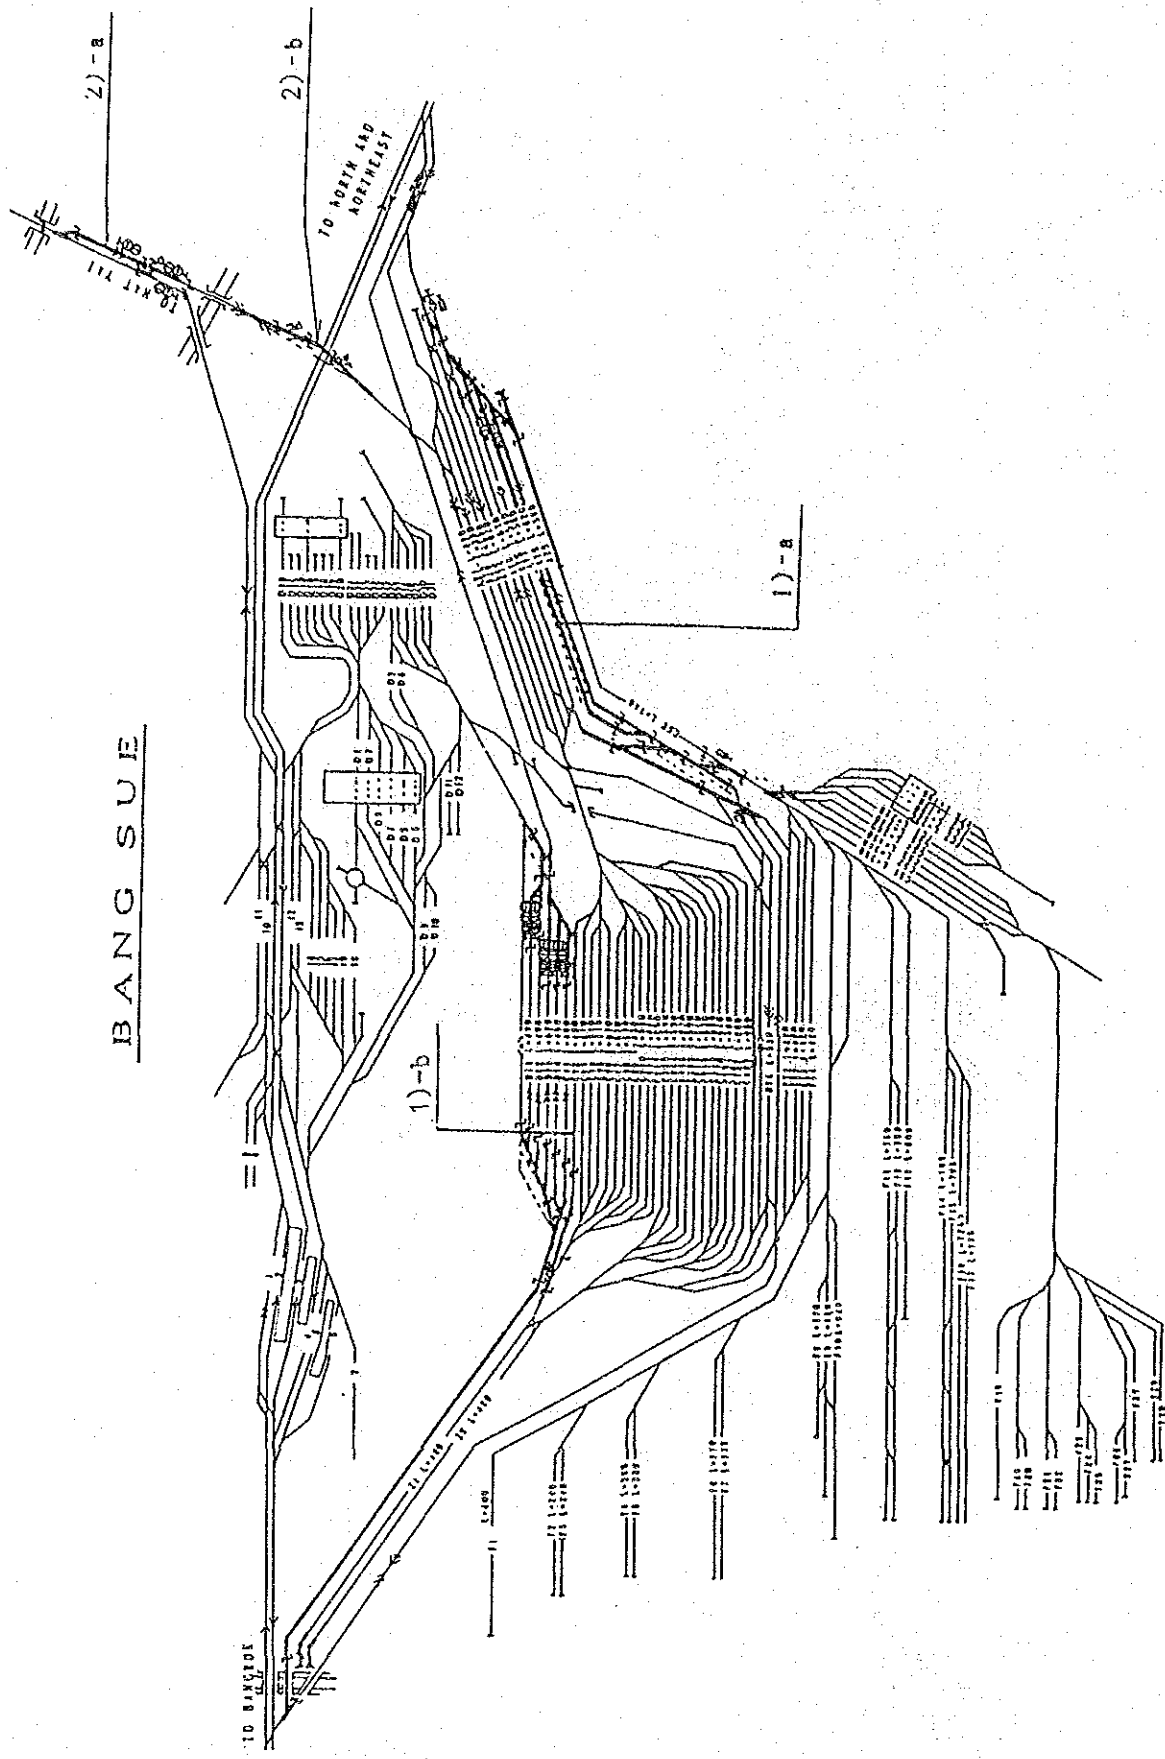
Future Signalling Facilities at Bang Sue Station (Master Plan)
